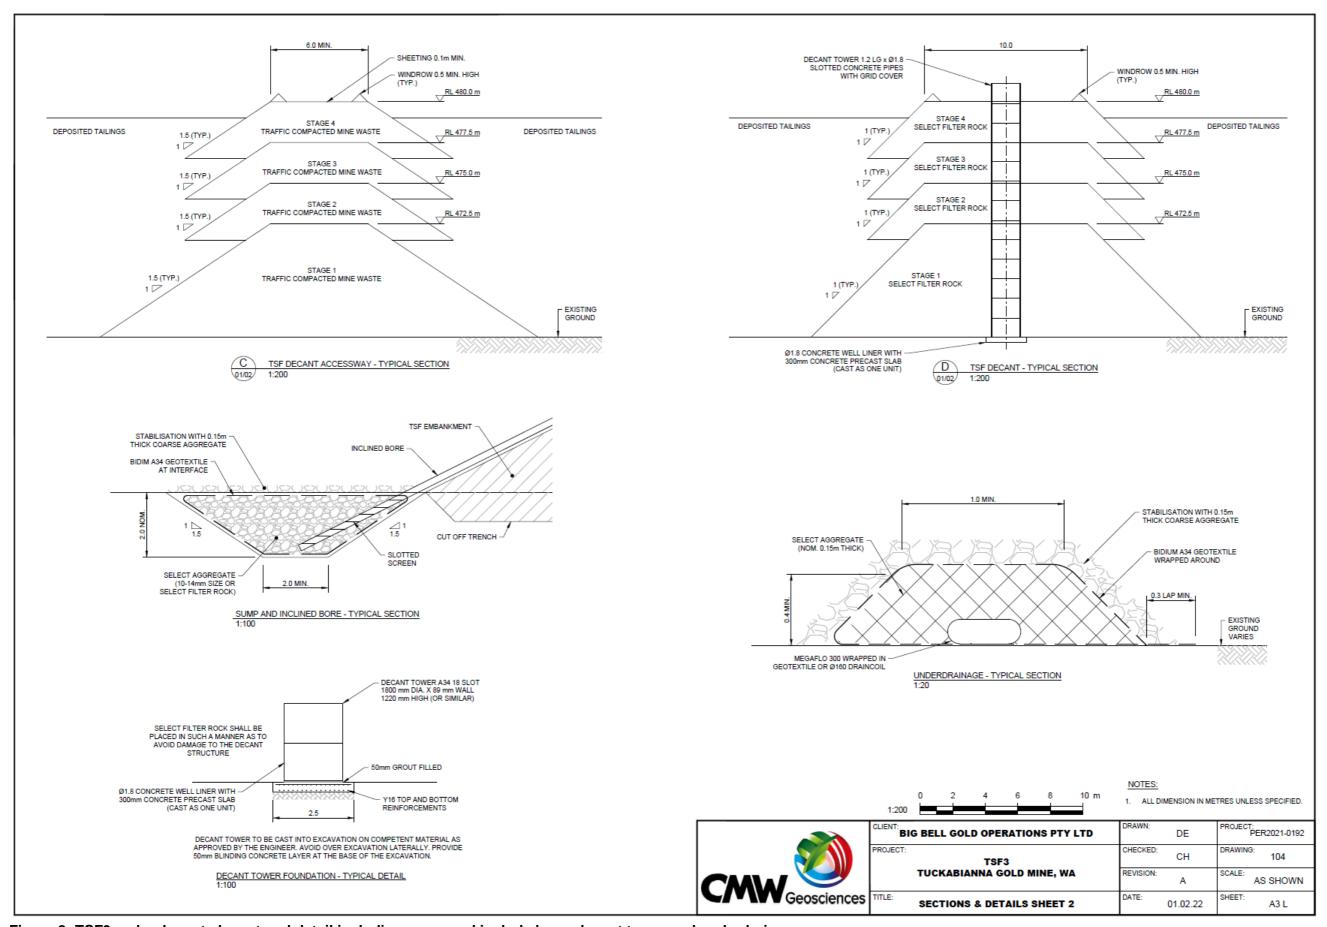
TSF3 embankments layout and detail including sump and include bore, decant tower and underdrainage
